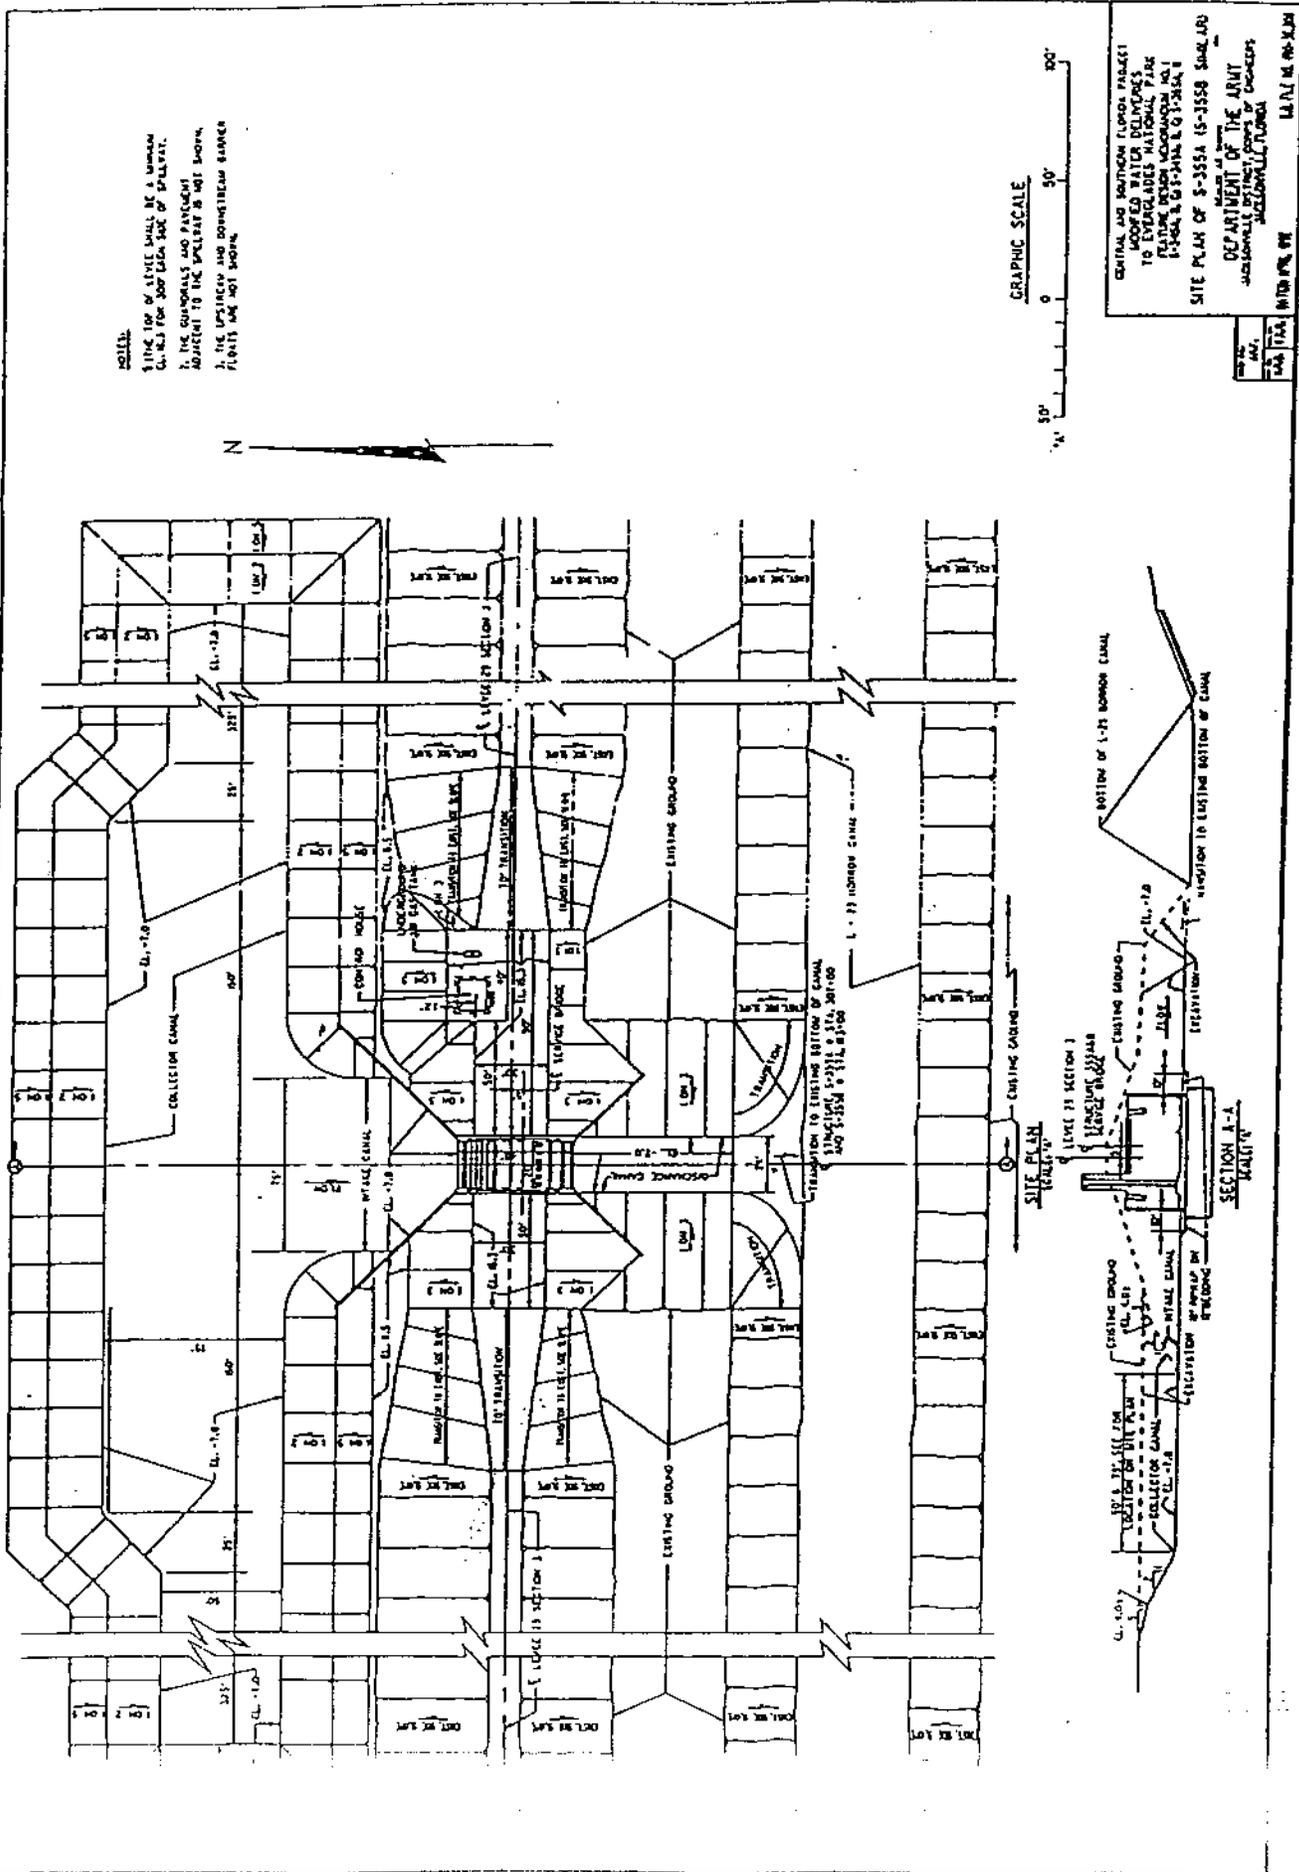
CONSTRUCTION SITE PLAN FOR S-355 STRUCTURES
